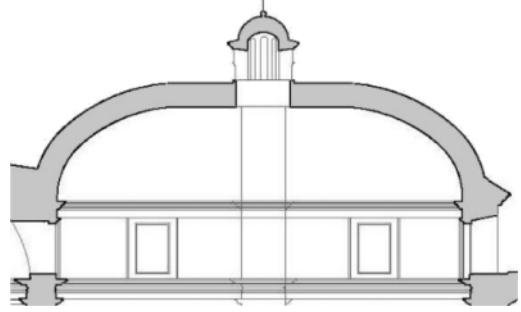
Quito, Santa Clara church, longitudinal section, central aisle oval dome (CIMPC 1993a; López 2015).
